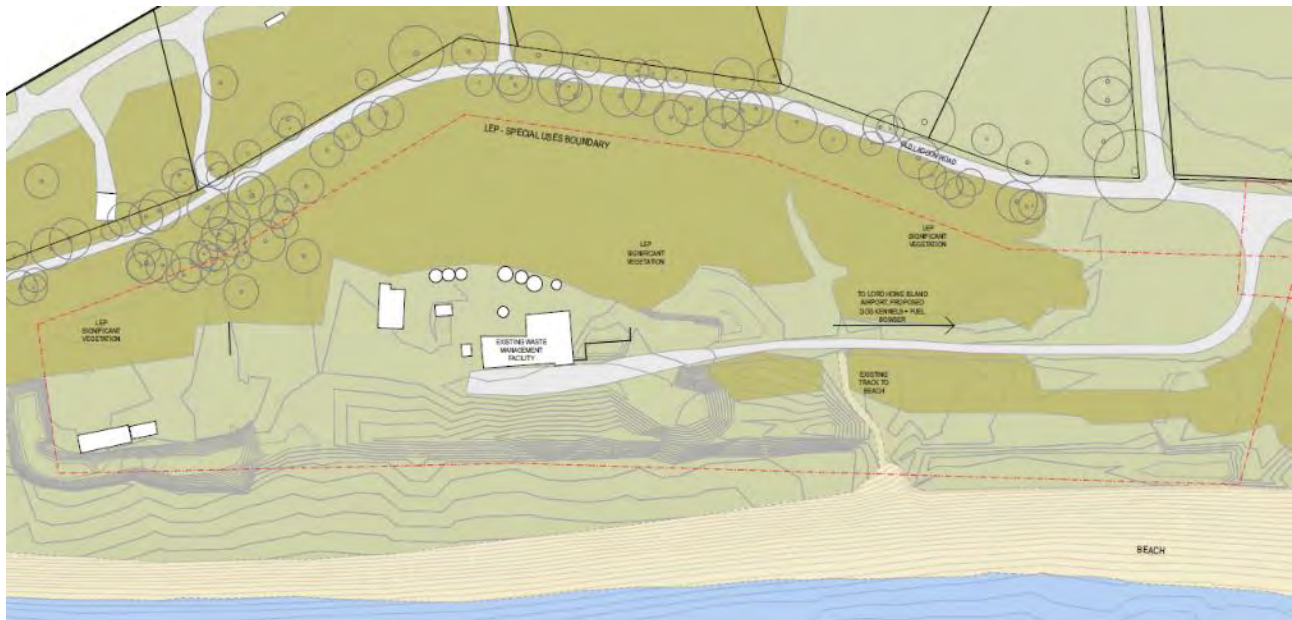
SOUTH ZONE: EXISTING SITE PLAN – WMF, DRAWING NO. A-DA-11.11 REV 04, 06/08/2025 (LAHZNIMMO ARCHITECTS)
